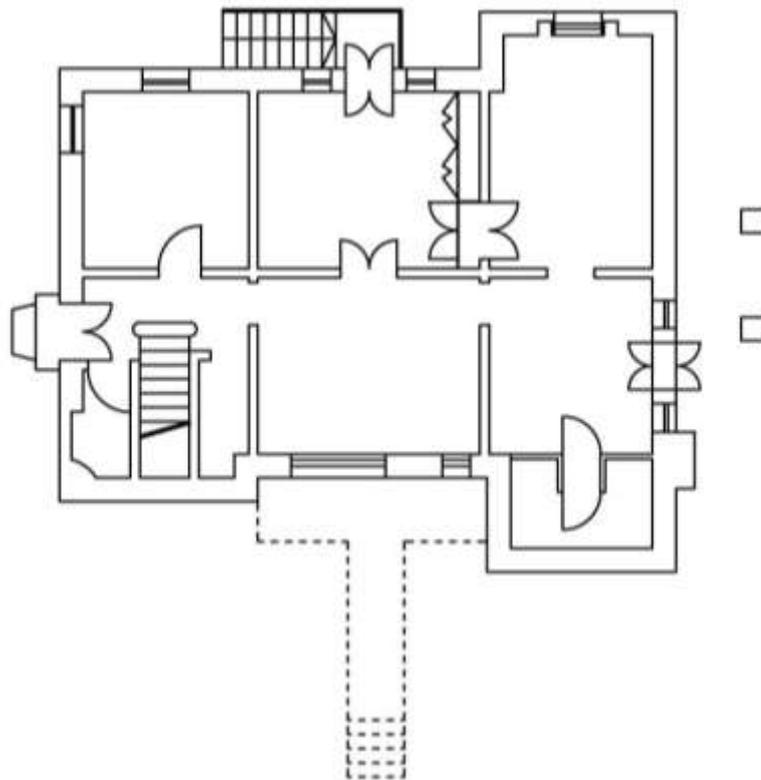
The basement plan of the house at 140 lot 4 parcel
